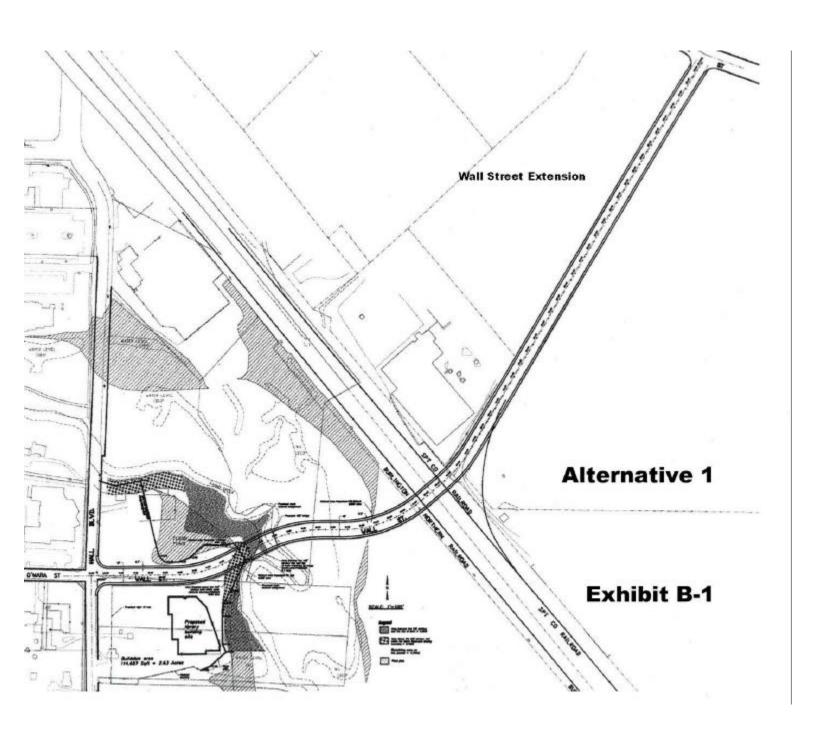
to B-4 – Alternative alignments for the Wall Street Extension
